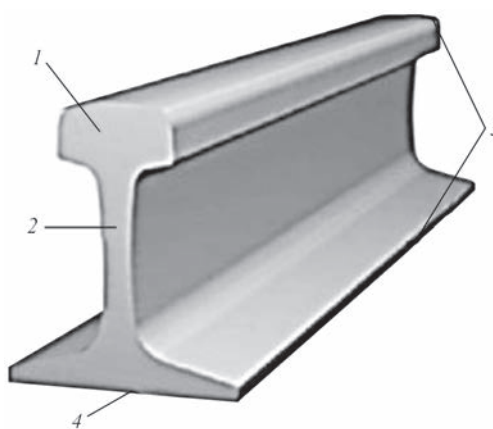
Location of rail defects across the cross-section [6]: 1 — in the rail head (74 %); 2 — in the web (7 %); 3 — other defects outside the joint (16 %); 4 — in the rail flange (3 %)
